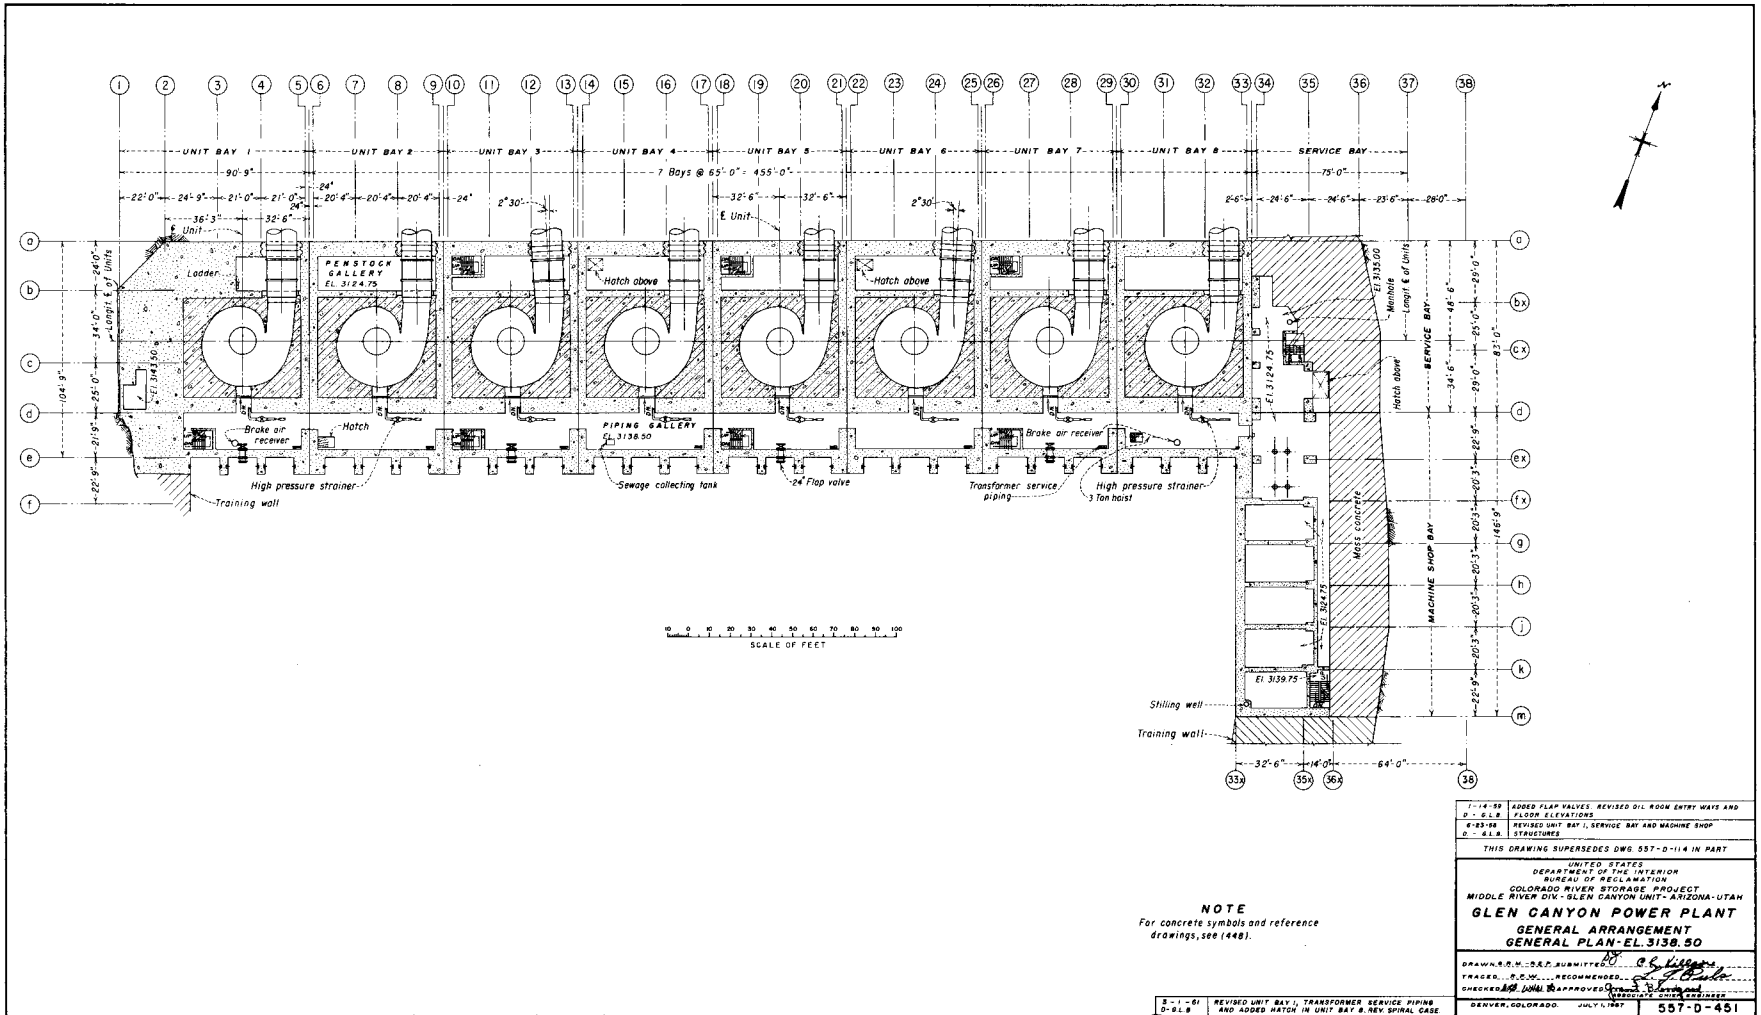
Powerplant general arrangement—Plan, elevation 3138.50.
